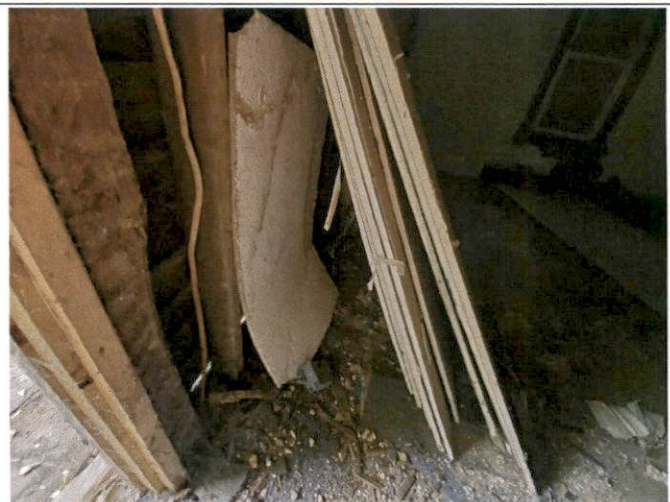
2x4 ceiling tile located behind drywall in living room.
